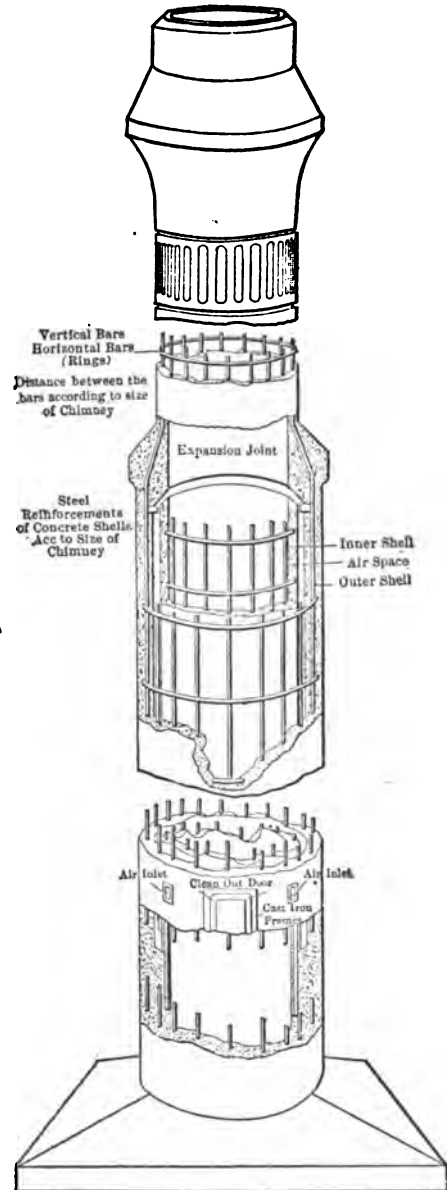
Weber Reinforced Concrete Chimney (*Power*).
